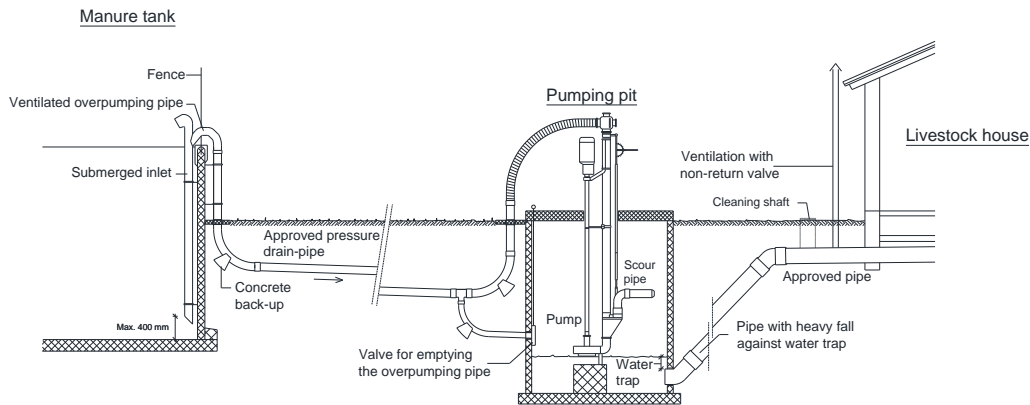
Pumping system from collecting pit to storage tank. Source: Romaniuk, Overby, 2004b
